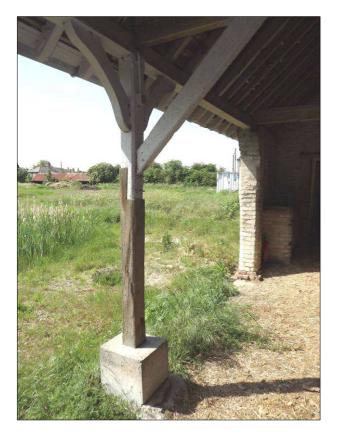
(Shot 3): Building B south elevation showing B1 –B3, looking north-northwest. 2m scale
